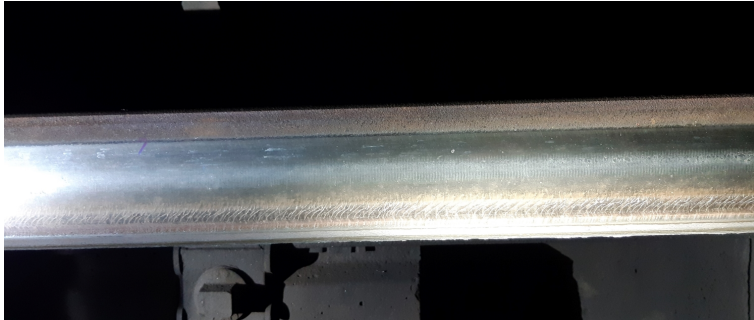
Medium head-check rail section for a large inspection, with thin cracks close to each other.
